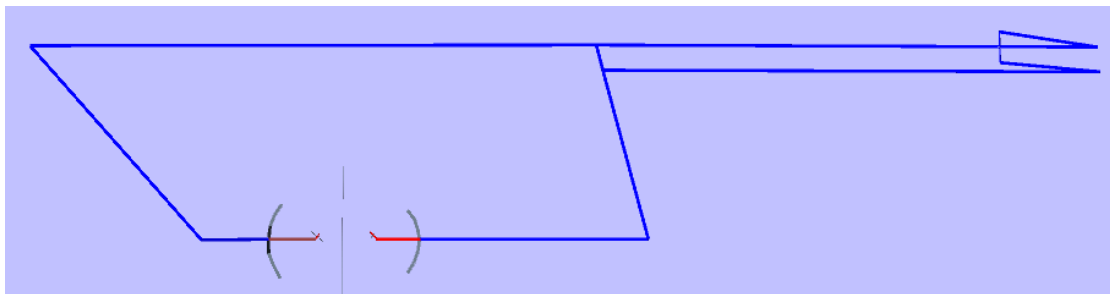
Holing the ramp and on-reef development into the open pit
